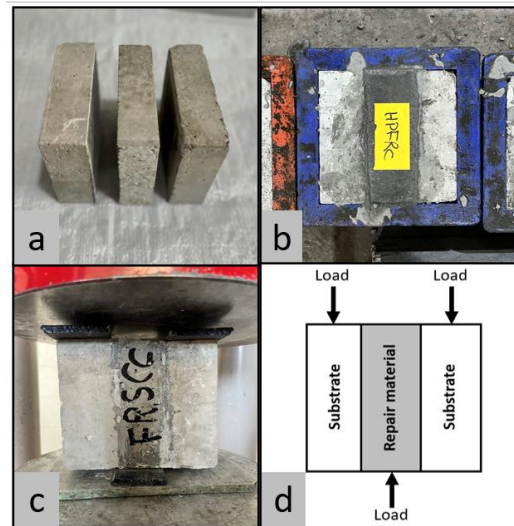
(a) Cutting of 5 cm-thick concrete blocks (b) casting 5cm-thick of repair concrete (c) test setup (d) test setup diagram
